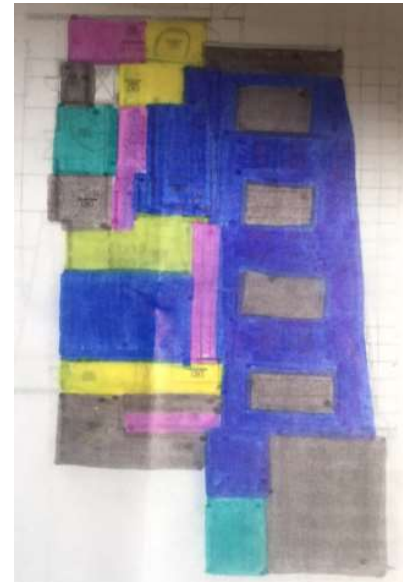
Mumbai Historical Archive Architectural Drawing
